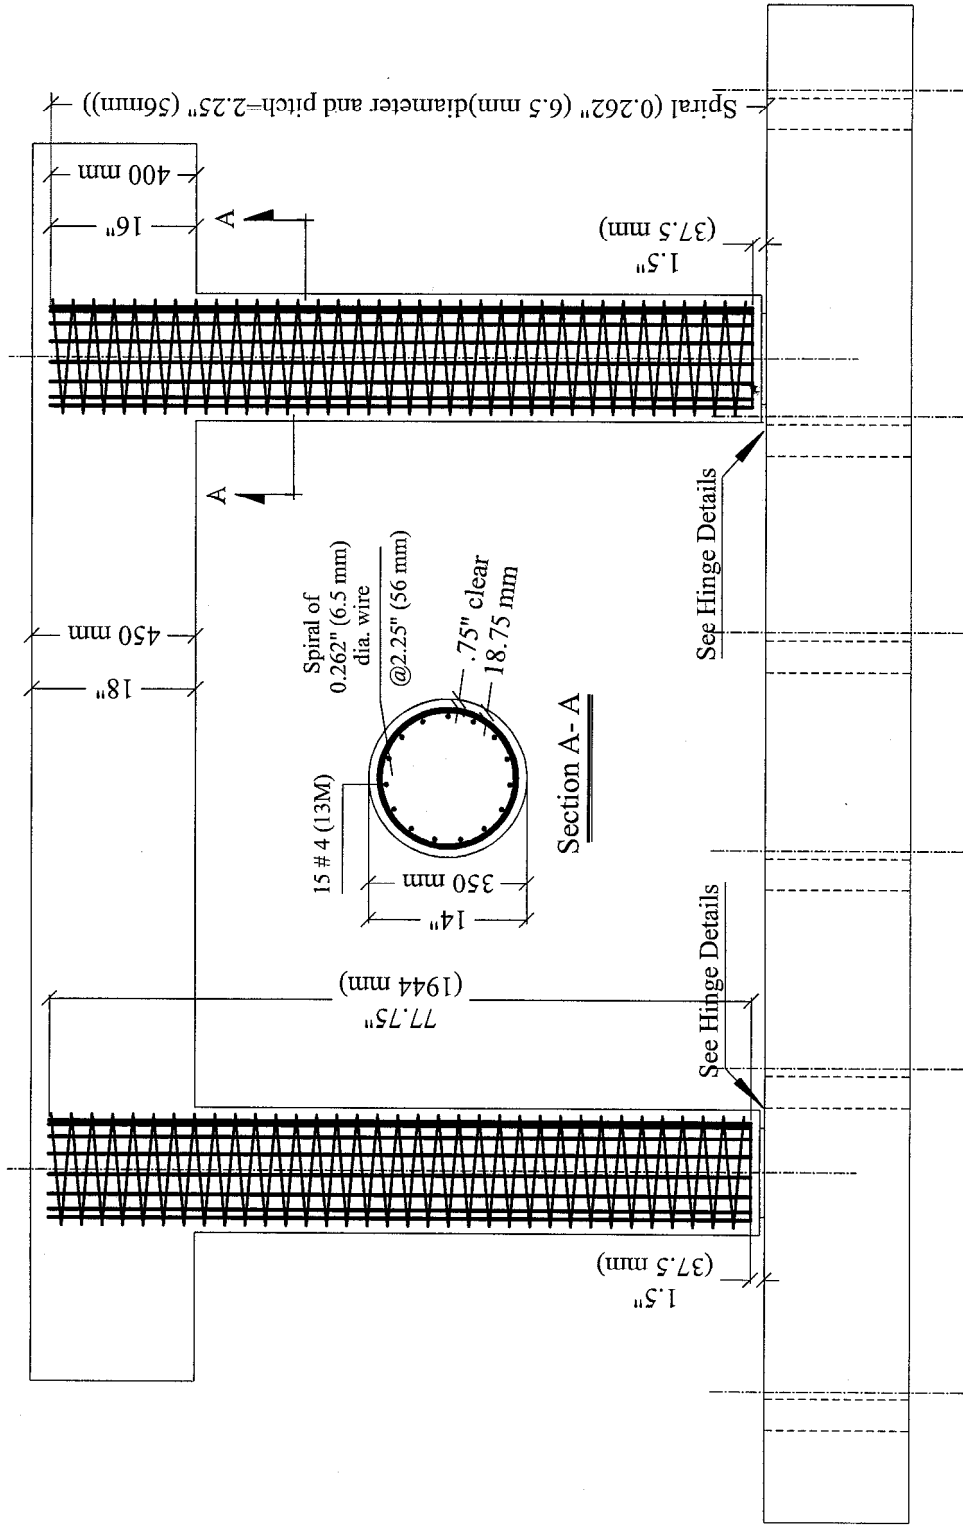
Columns Longitudinal and Transverse Reinf. of Specimen B2CM
